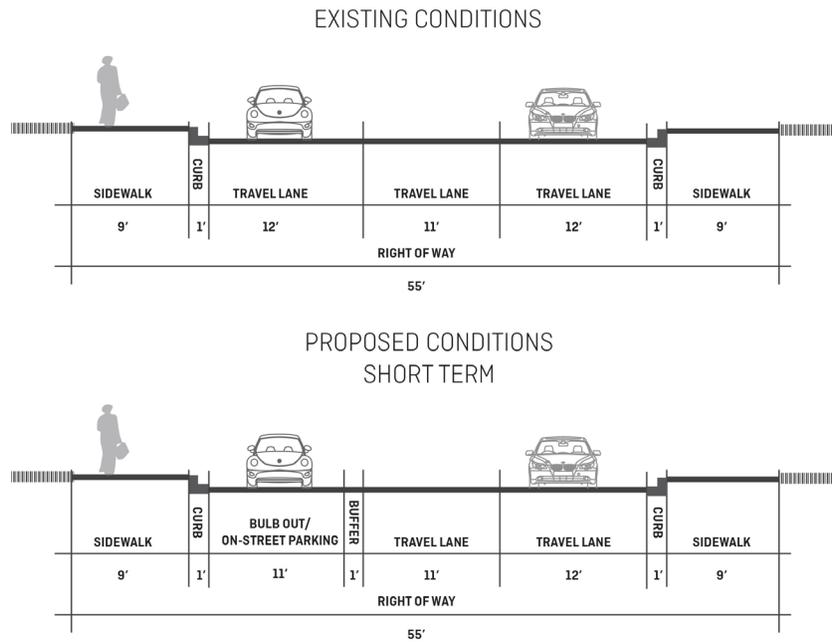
Willard Street at Hughlett Avenue (West Bound)
